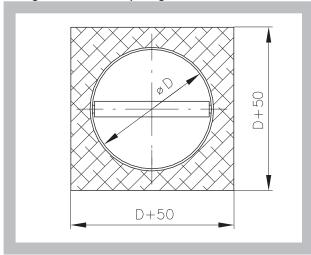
Built-in edge - design with outer mechanical control or actuating mechanism
